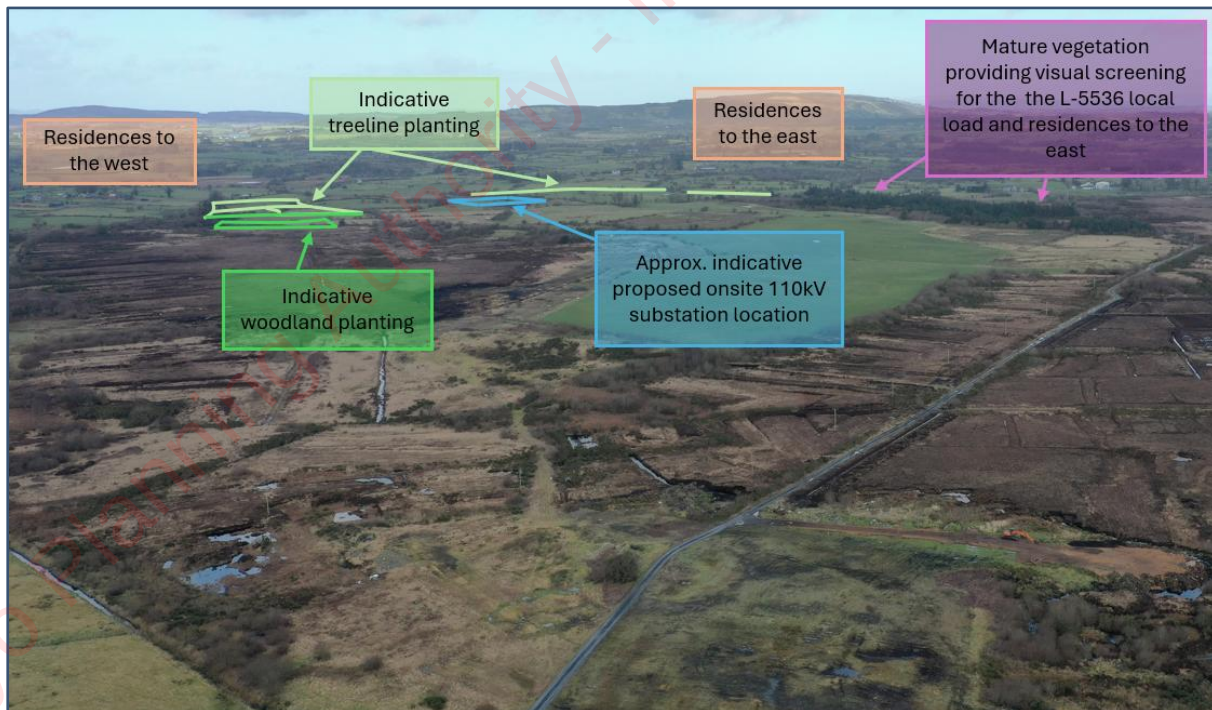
Drone imagery showing approximately locations of the proposed onsite 110kV substation, residences, existing mature vegetation, and proposed treeline/hedgerow planting.
